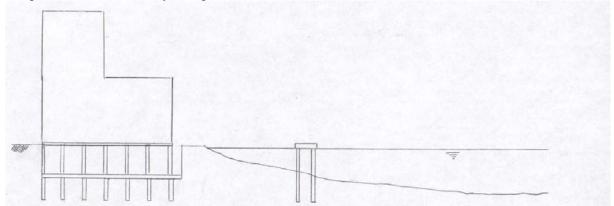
Stage 3: Placing of anchor walls and pylon foot.
